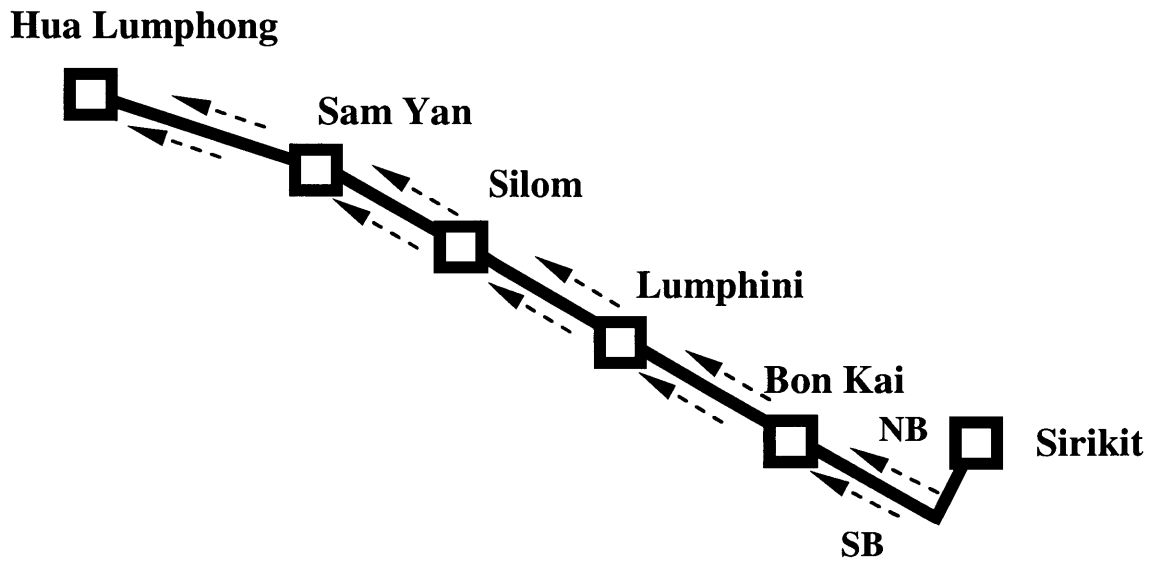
Tunnel drive sequence of Section D (South Section)
